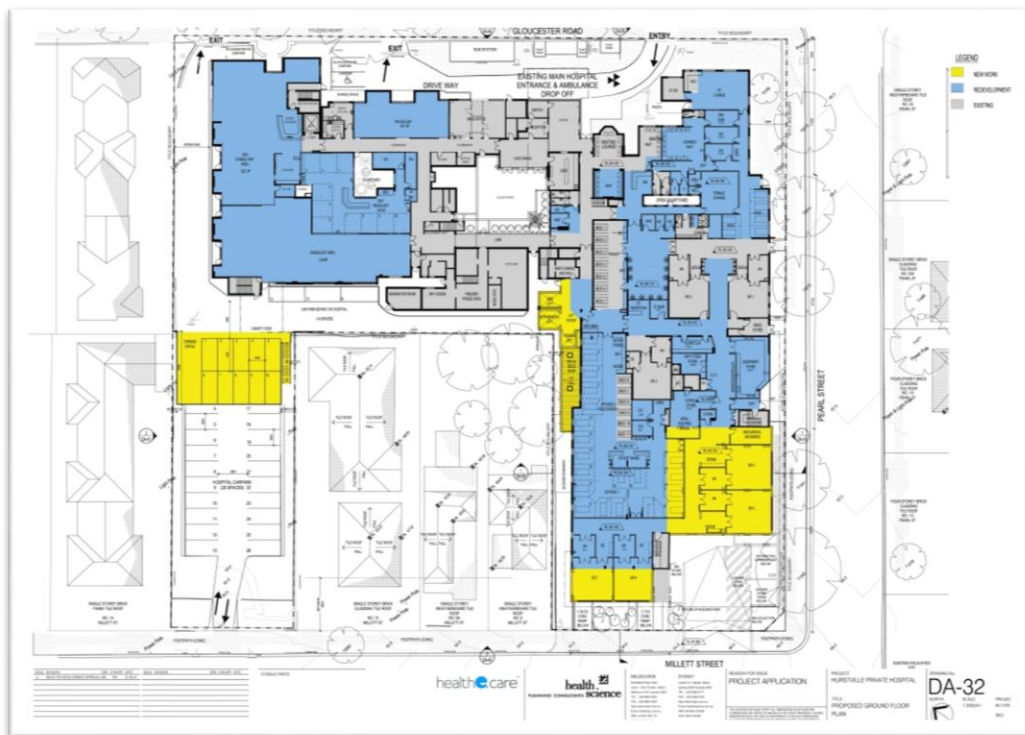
GROUND LEVEL PLAN: PROPOSED WORKS
